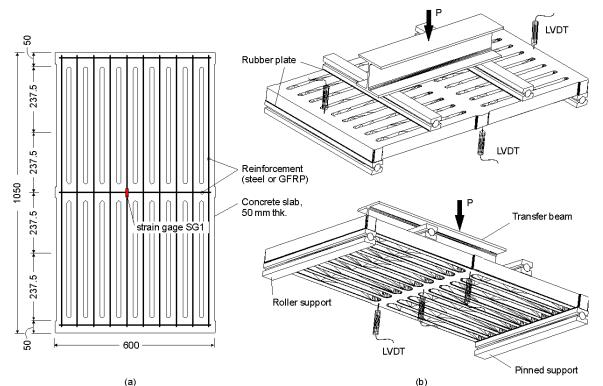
Typical a) plan view and reinforcement details of slabs, and b) 3D view of test setup and instrumentation from top and bottom of slabs.
